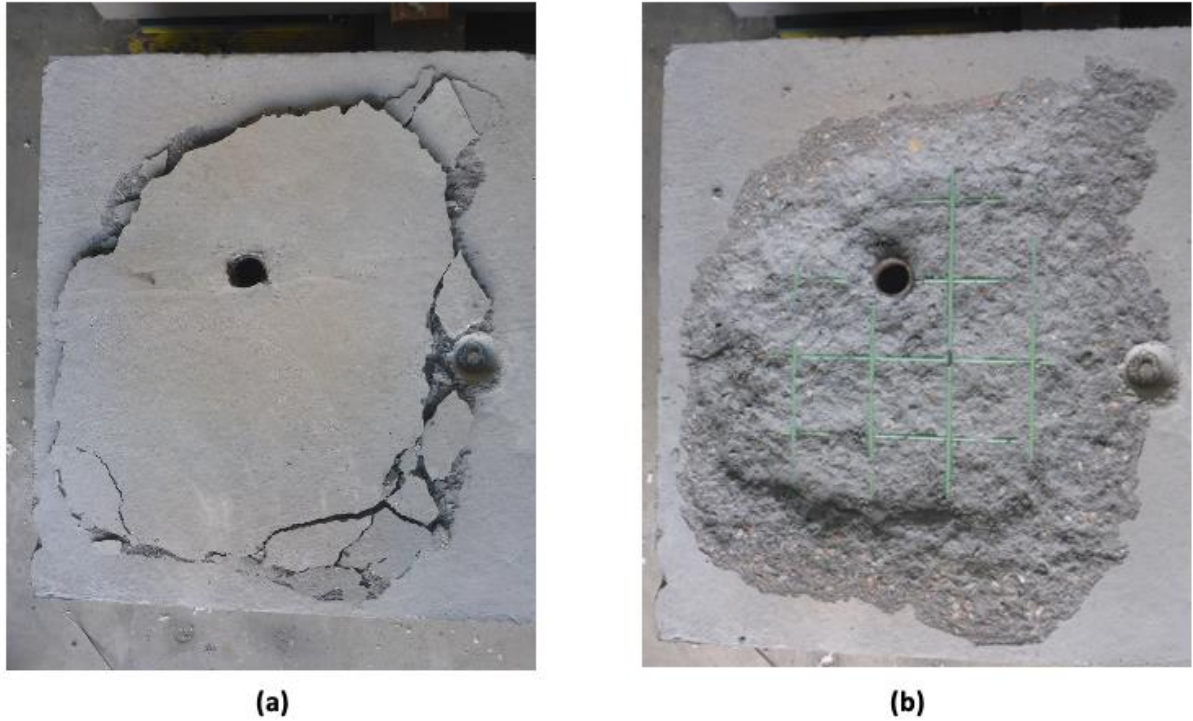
Spalling around metal insert, batch 2, 12in from left edge, 4 minutes after being at 500°C (932°F) (a) spalled concrete in place on specimen (b) after removal of spalled concrete
